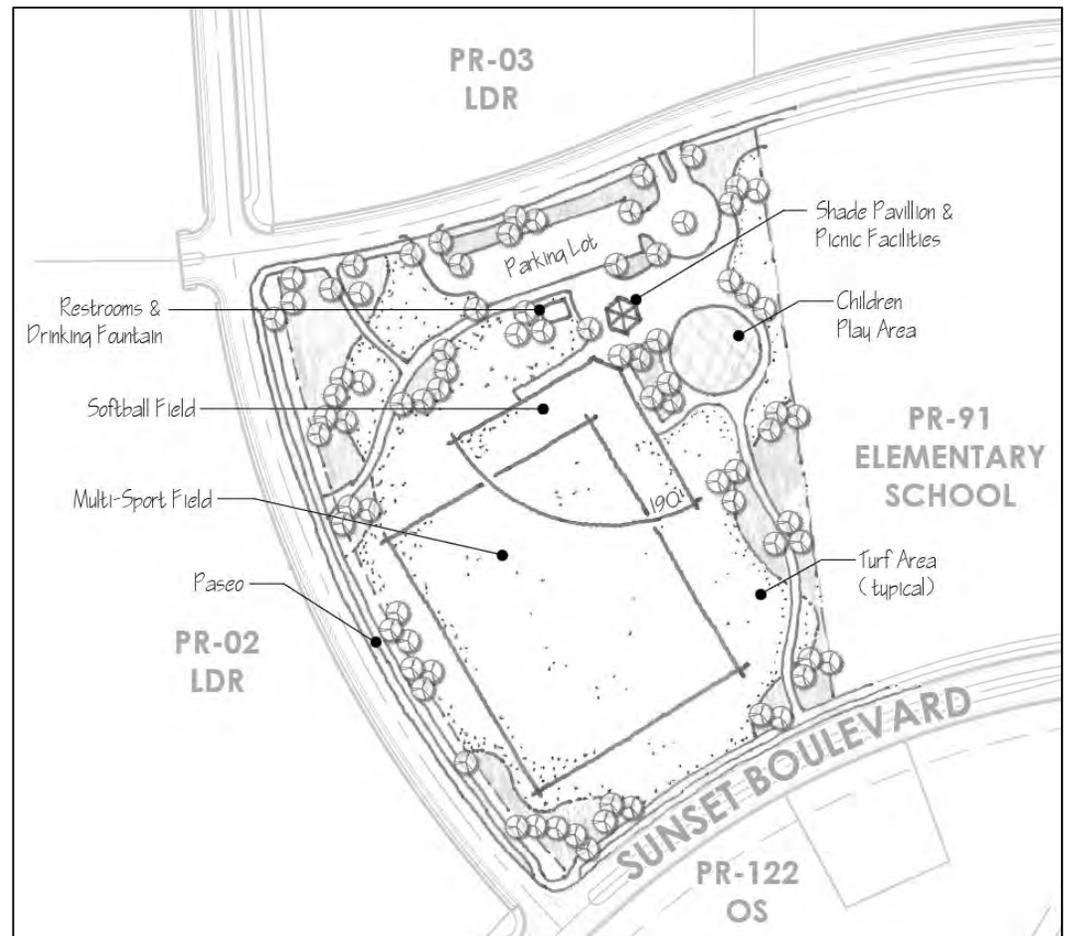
CONCEPT PLAN FOR PARK SITE PR-101
